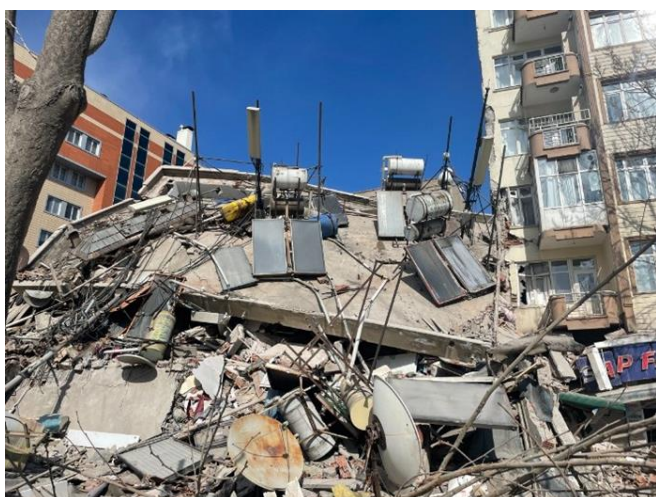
Photo of a collapsed building with a base station (Source: Manset61.com)
